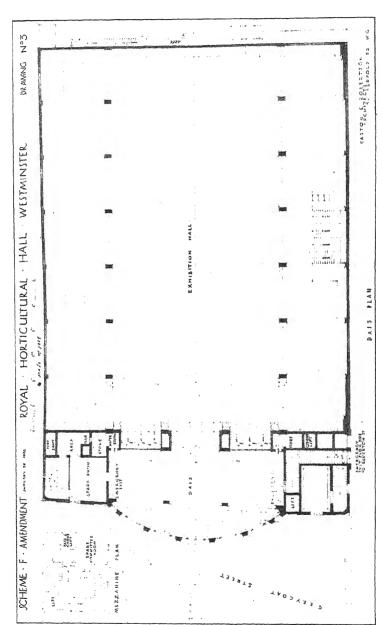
The Proposed New Hall. Play showing Exhibition Space.
